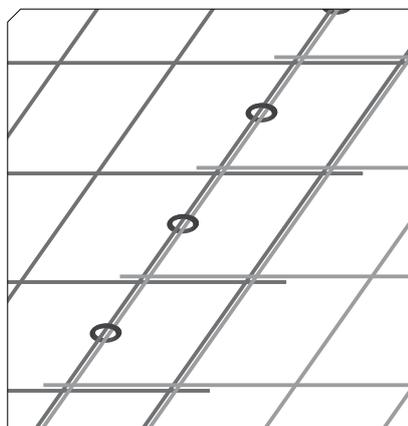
Overlapping of adjacent runs of mesh by one opening width. Steel staples are required to fix runs of mesh where purlin spacing exceeds 1.7 metres.
